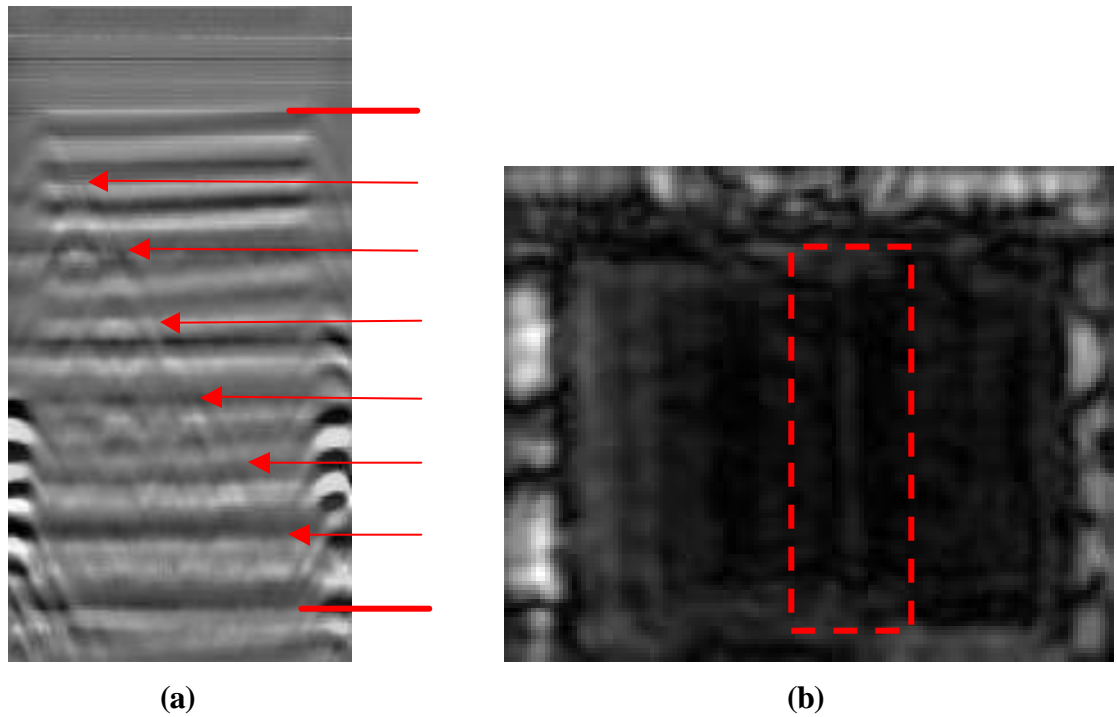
Variable depth reinforcing steel specimen (a) raw PERES II response elevation view indicating six pieces of reinforcing steel, designated by arrows (b) reconstructed plan view response (9 cm depth) with a detected reinforcing steel bar enclosed by a dashed line box.
